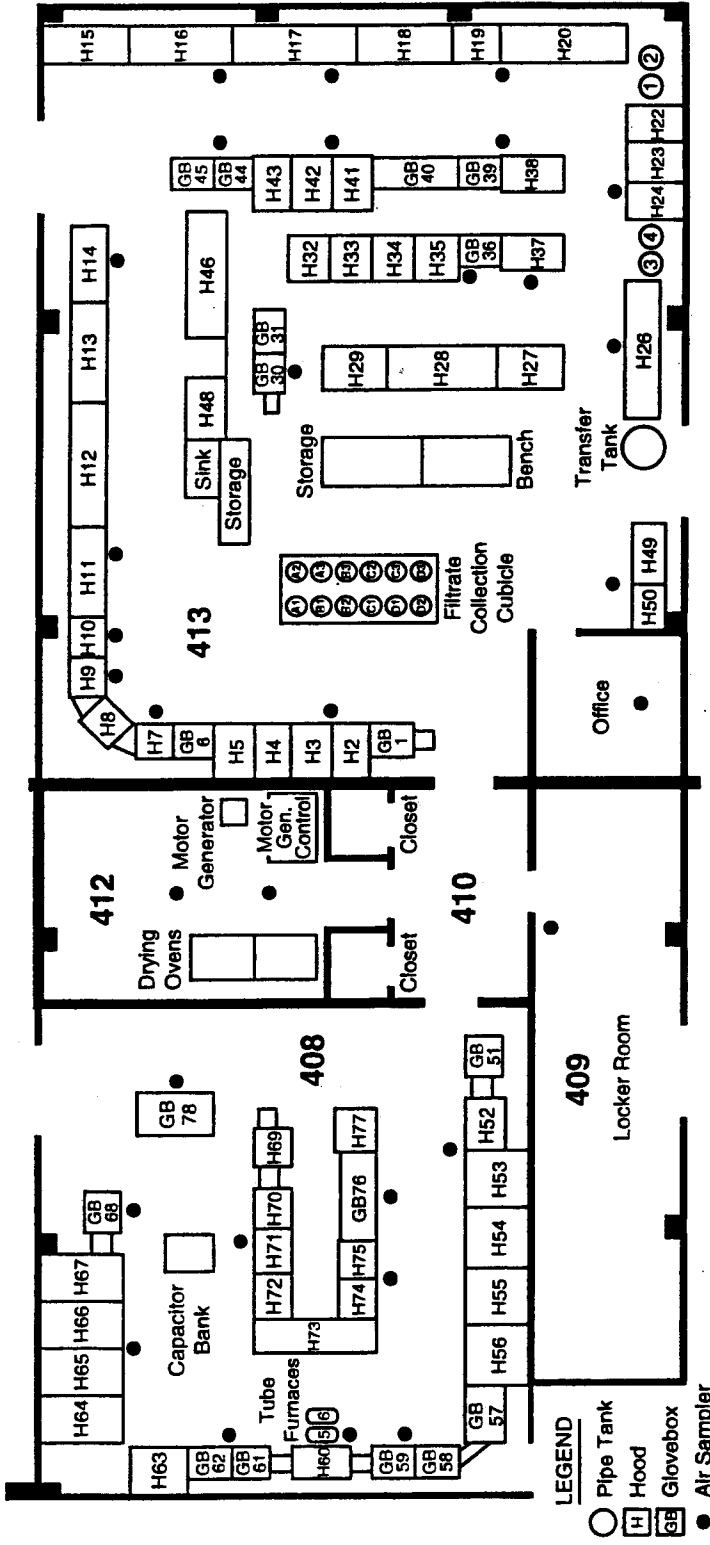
Floorplan of the Final Recovery and Purification Plant (Building 4 South).
